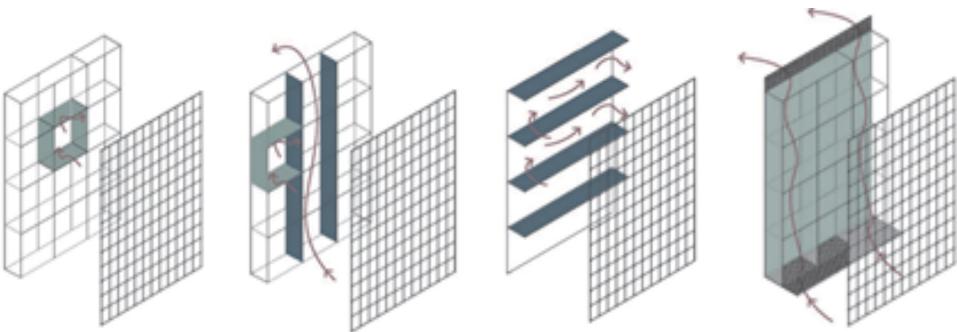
Box Facade (a) Shaft-Box Facade (b) Corridor Facade (c) Multi-Story Facade(d)
